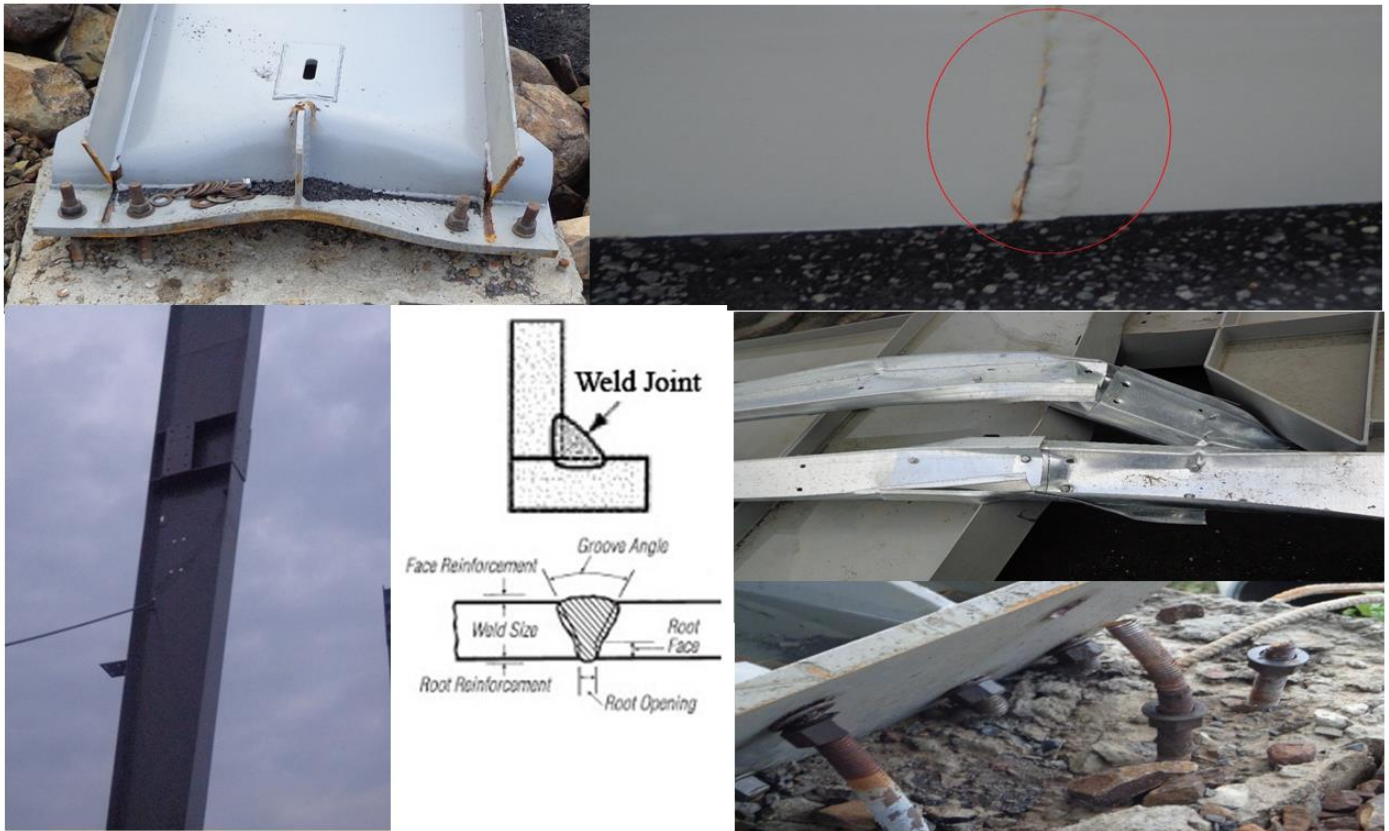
Insufficient Welding, Inconsistent Detailing, Level Difference in Pedestal & Baseplate
